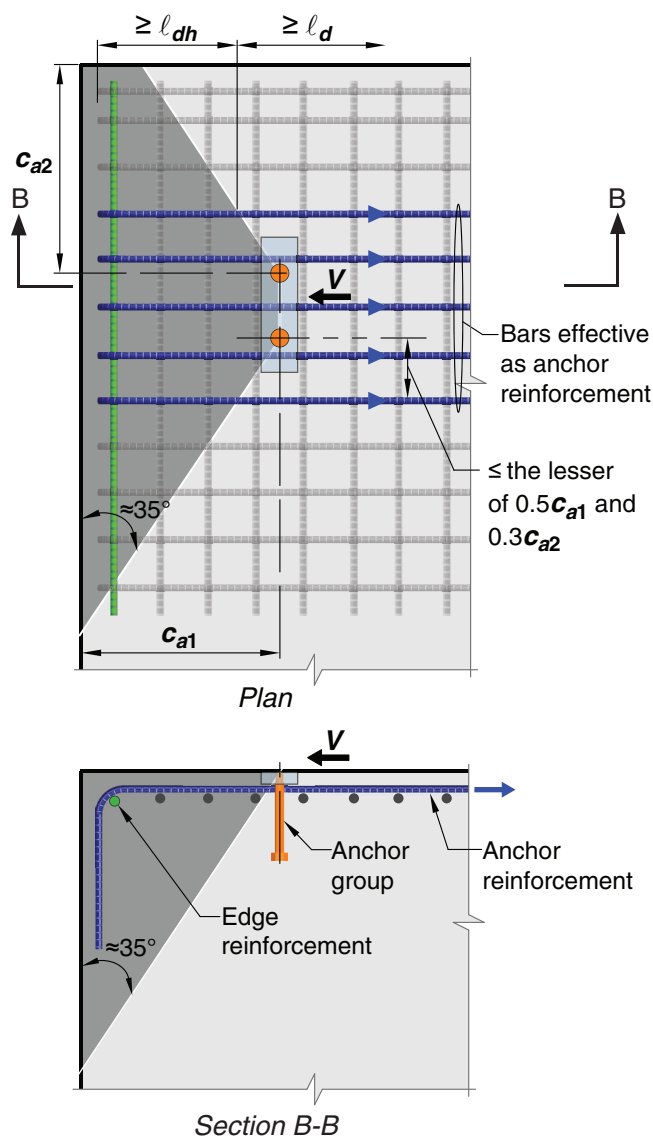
(ii)—Edge reinforcement and anchor reinforcement for shear.
